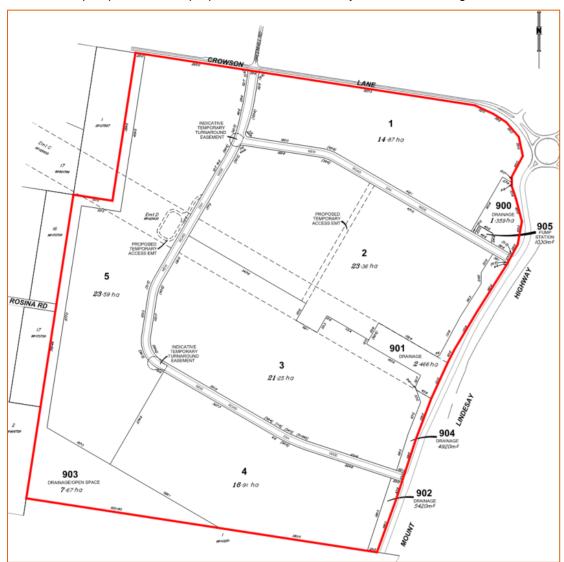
Proposed Amended ROL Layout (Source: Wolters, August 2023)
